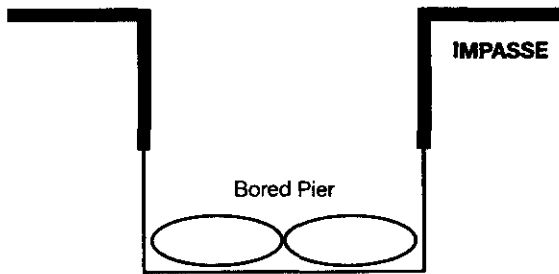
Shows position of Impasse Barrier fitted to bored piers.
